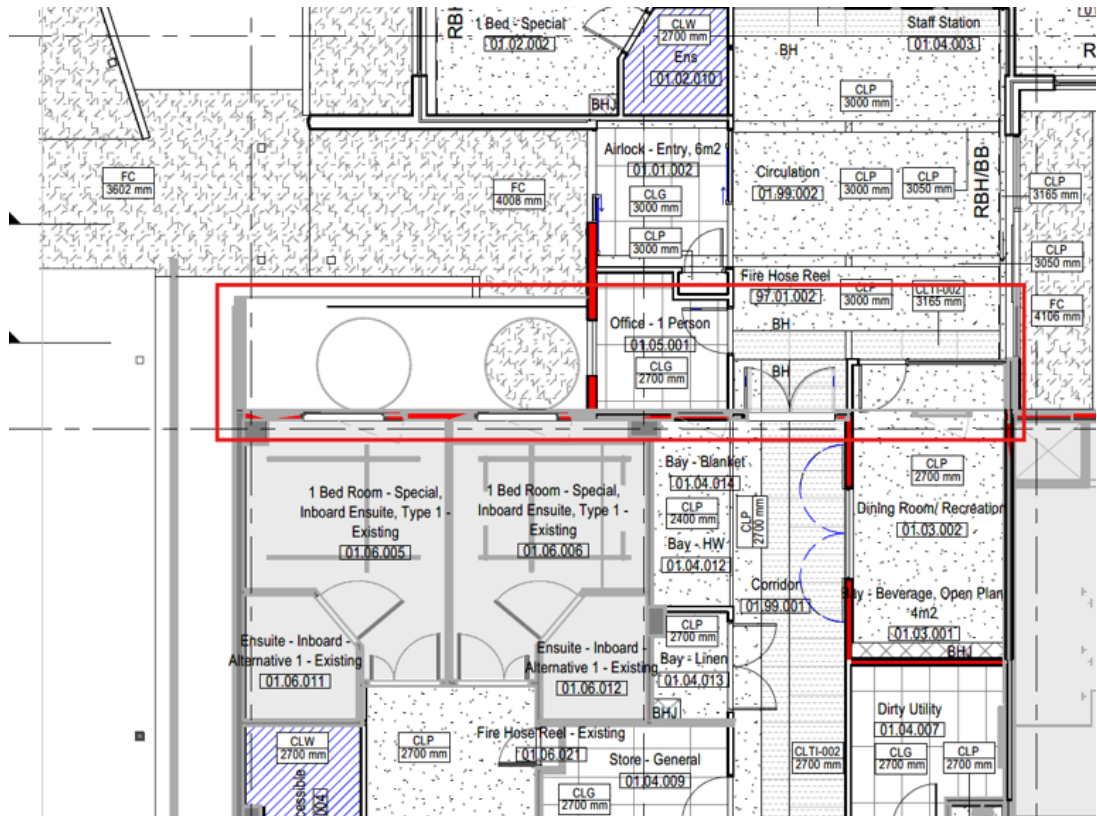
Floor Plan detailing the extent of the ballast roof extending over the 1 Bed Rooms within the existing Acute Services Building.
